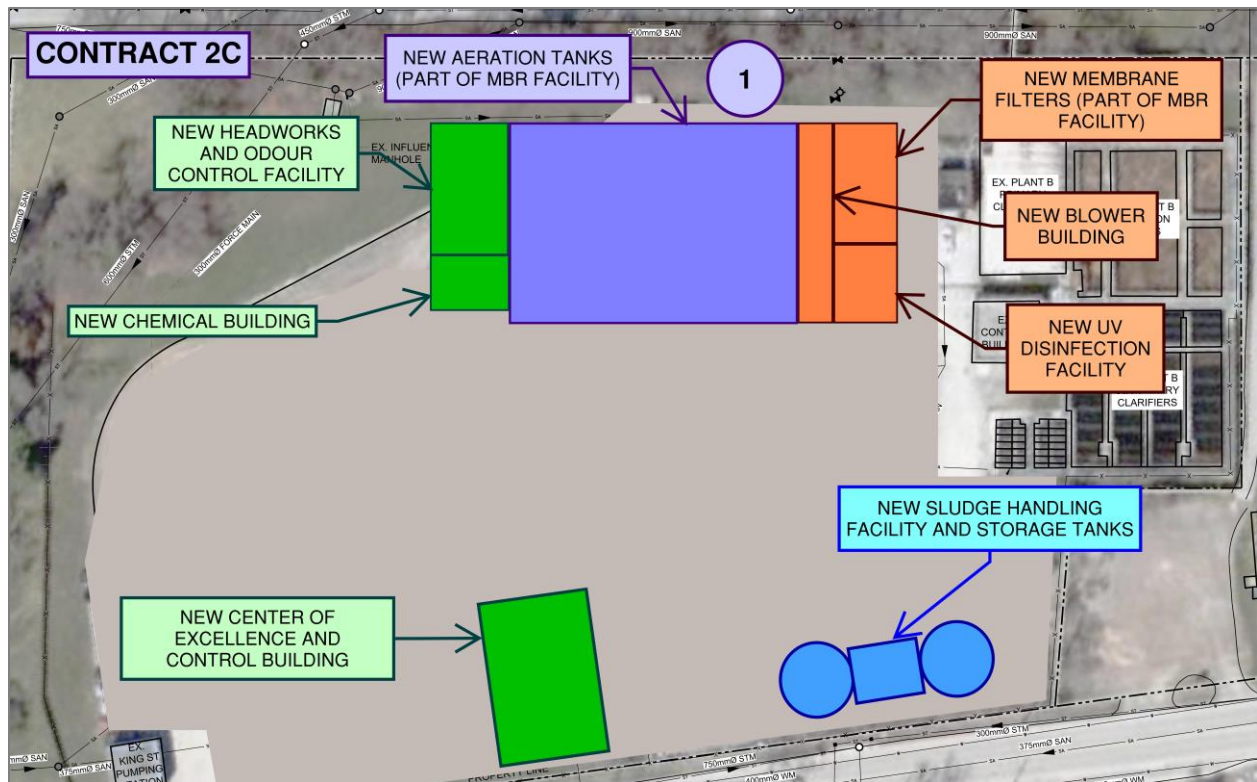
Site Layout A Implementation - Conceptual Contract 2C
